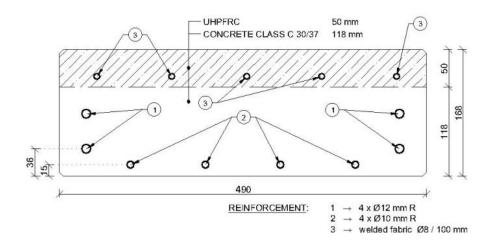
Typical cross section through the panel strengthened with a 50 mm UHPFRC layer and a Ø 8/100 mm additional reinforcing mesh
